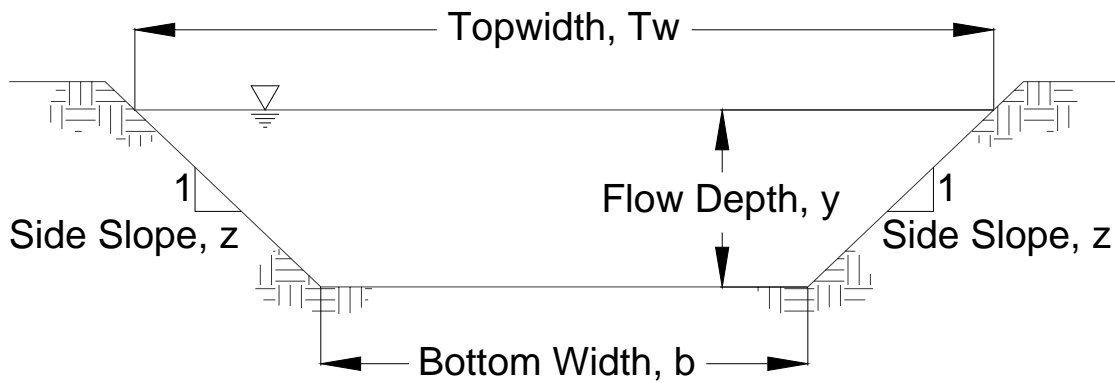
Typical Trapezoidal Cross-section Characteristics
